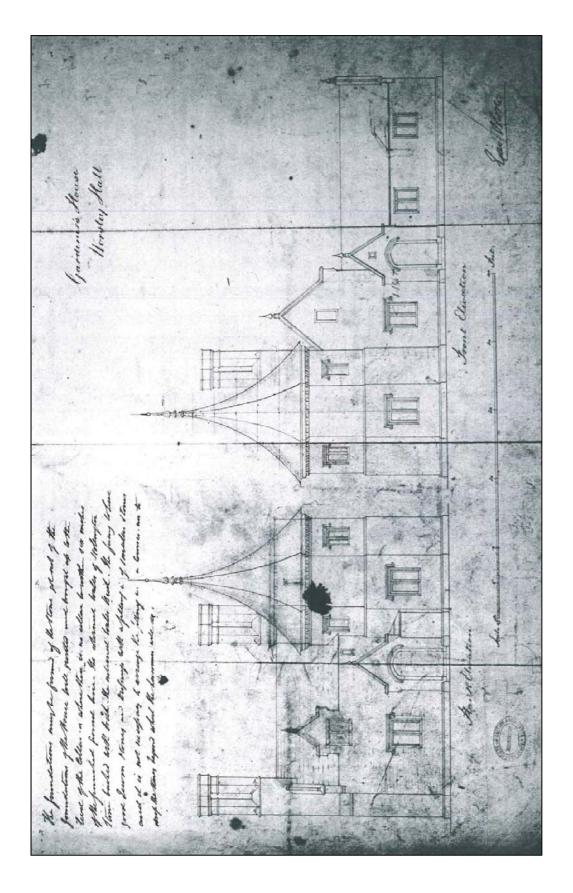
Undated architectural elevations by Edward Blore for the Garden Cottage, c. 1840-2 (Worsley New Hall Archive, Peel Group).
